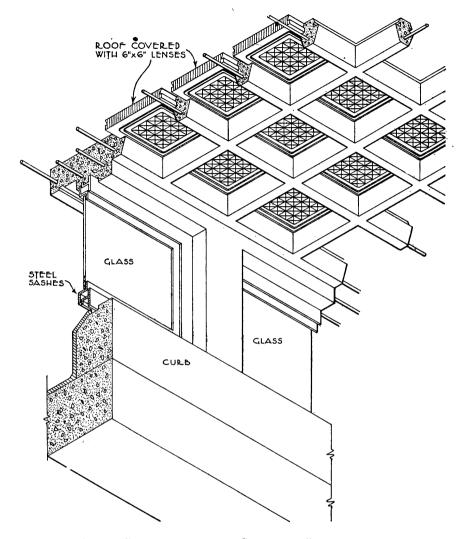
LANTERN LIGHT IN "GLASS-CRETE" ON RAISED CURB
